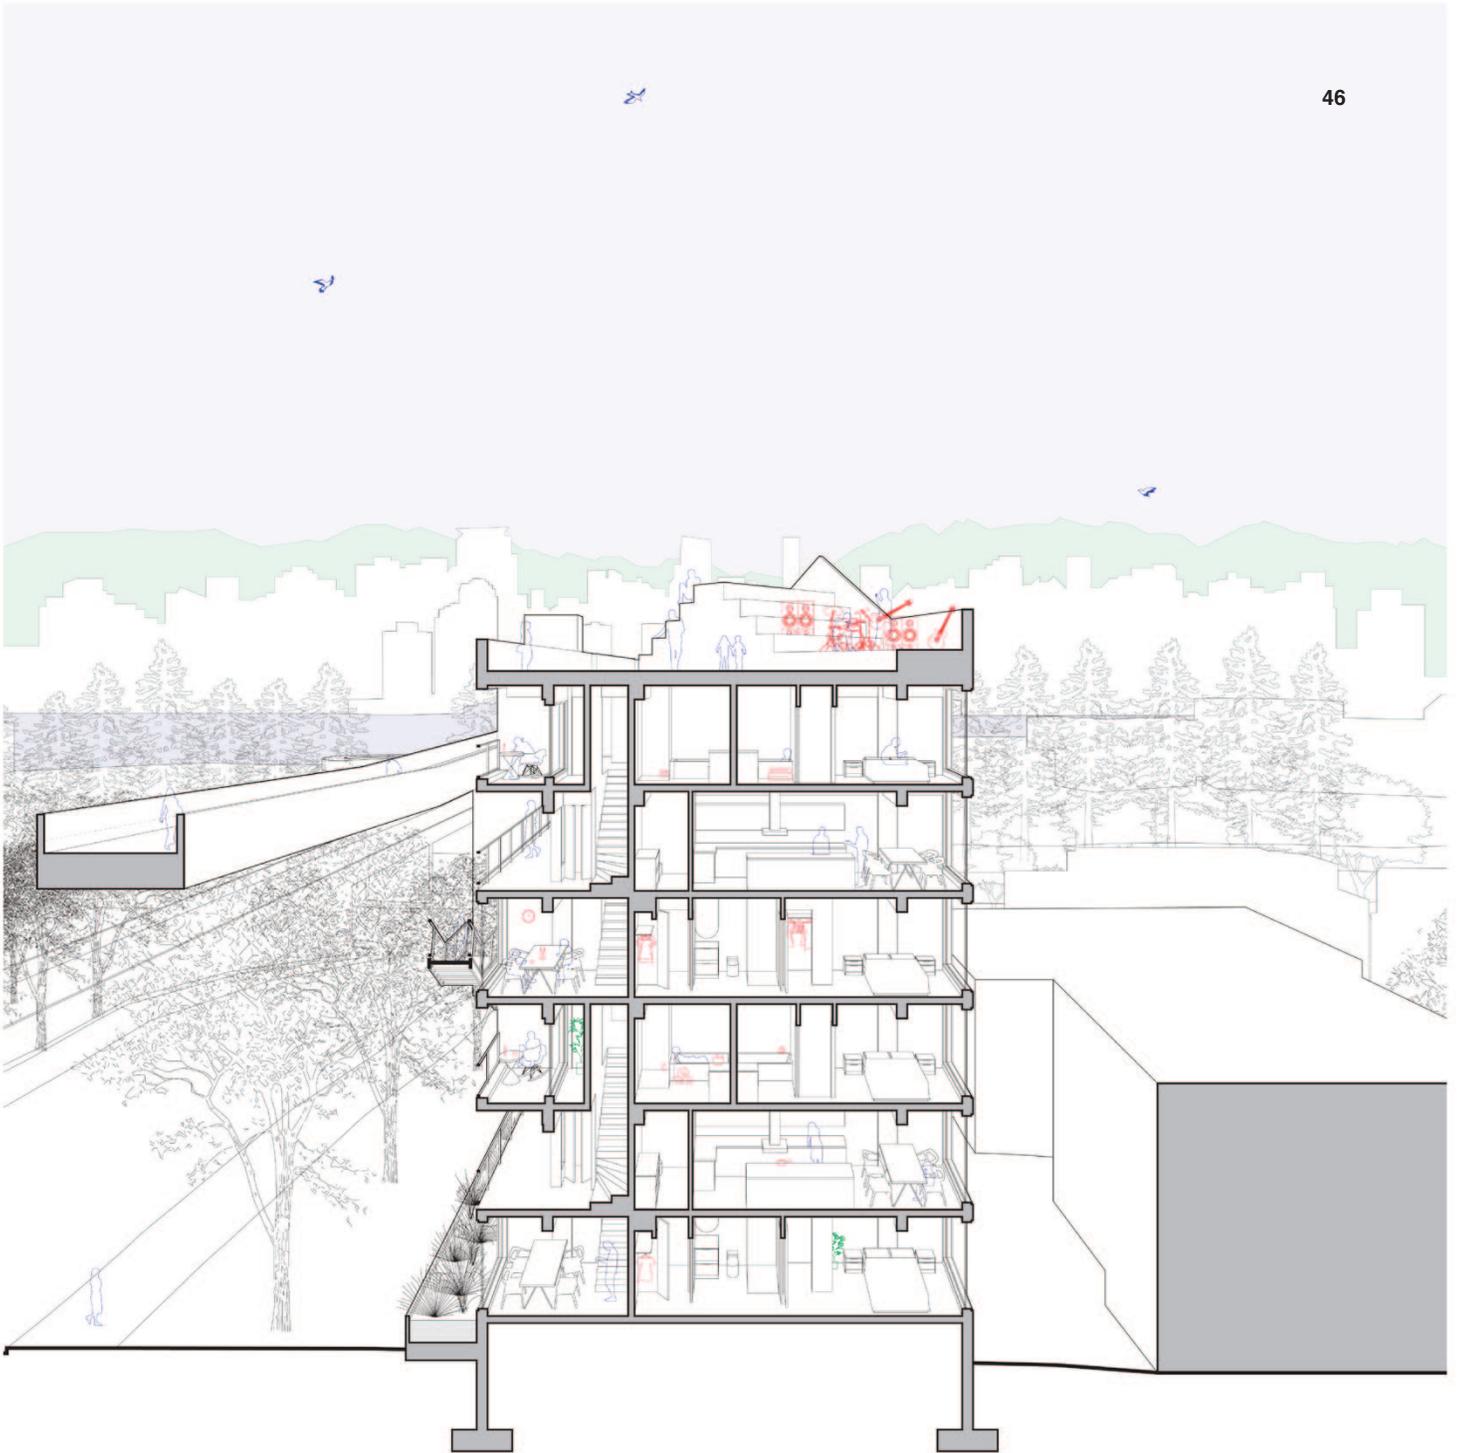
(Section Perspective — W 7th Ave. & Laurel St., Fairview Slopes)
